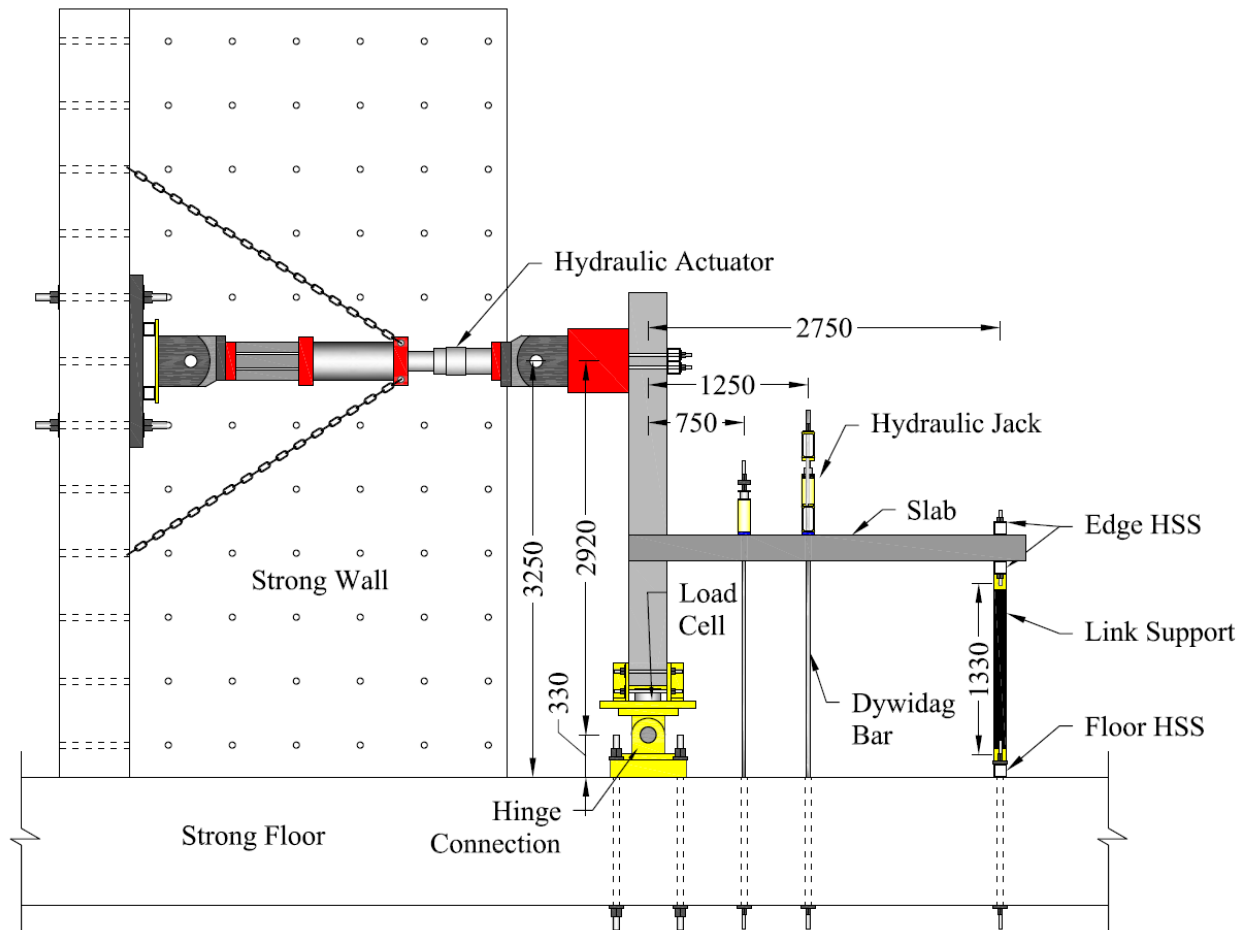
Schematic drawing of the test setup – elevation view (dimensions in mm)
